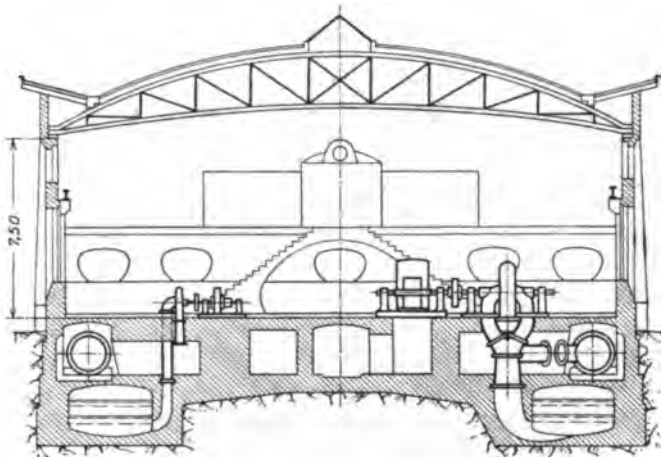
Transverse Section through Power House, Urftalsperre Plant.
